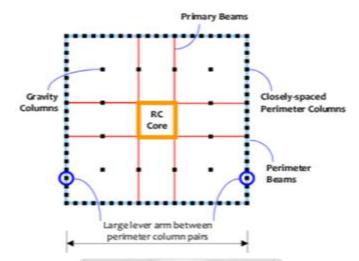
Structural Elements in a Tube System: Some columns (called Gravity Columns) are not necessarily connected with beams to either the Core or the Tube.
